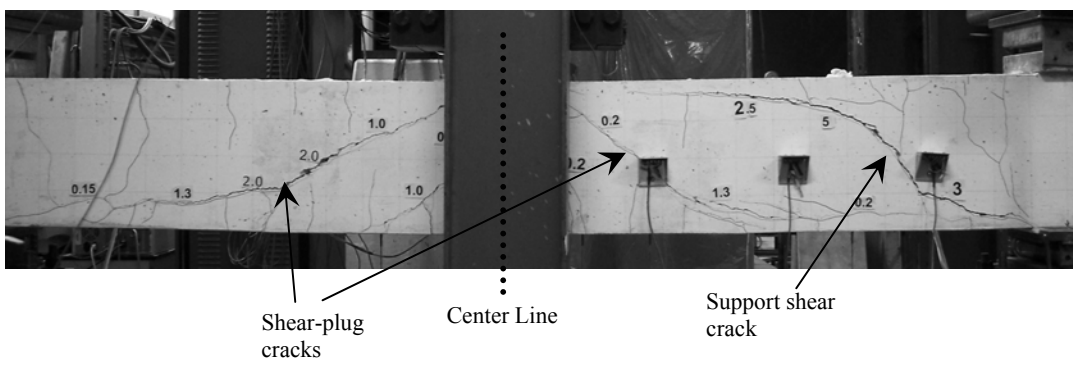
Typical cracks in a shear-critical specimen (SS1b-1)
